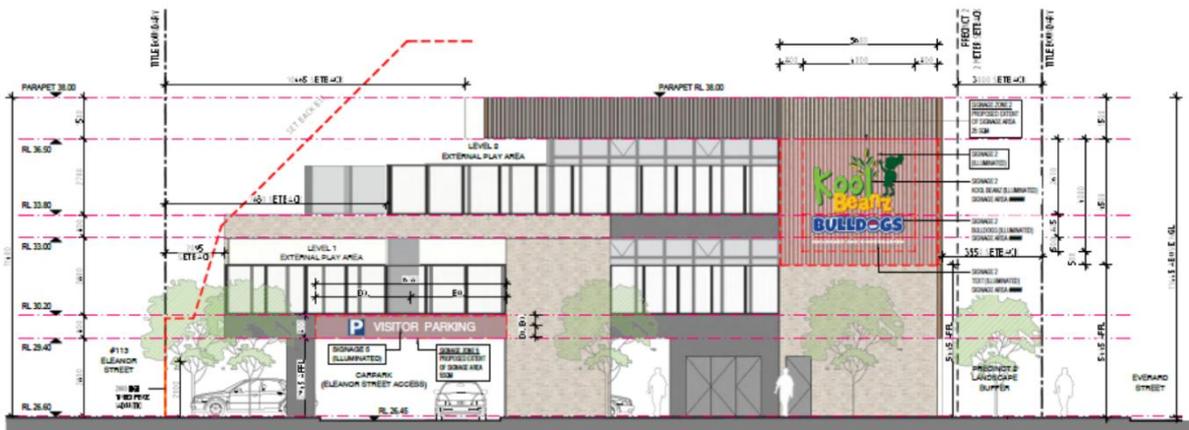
Proposed Eastern Elevation addressing Everard Street
